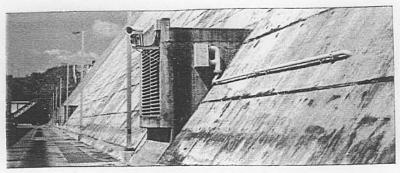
Cable Penetrators and Dry Junction Box. 4-Path, 8 Transducer Arrangement
